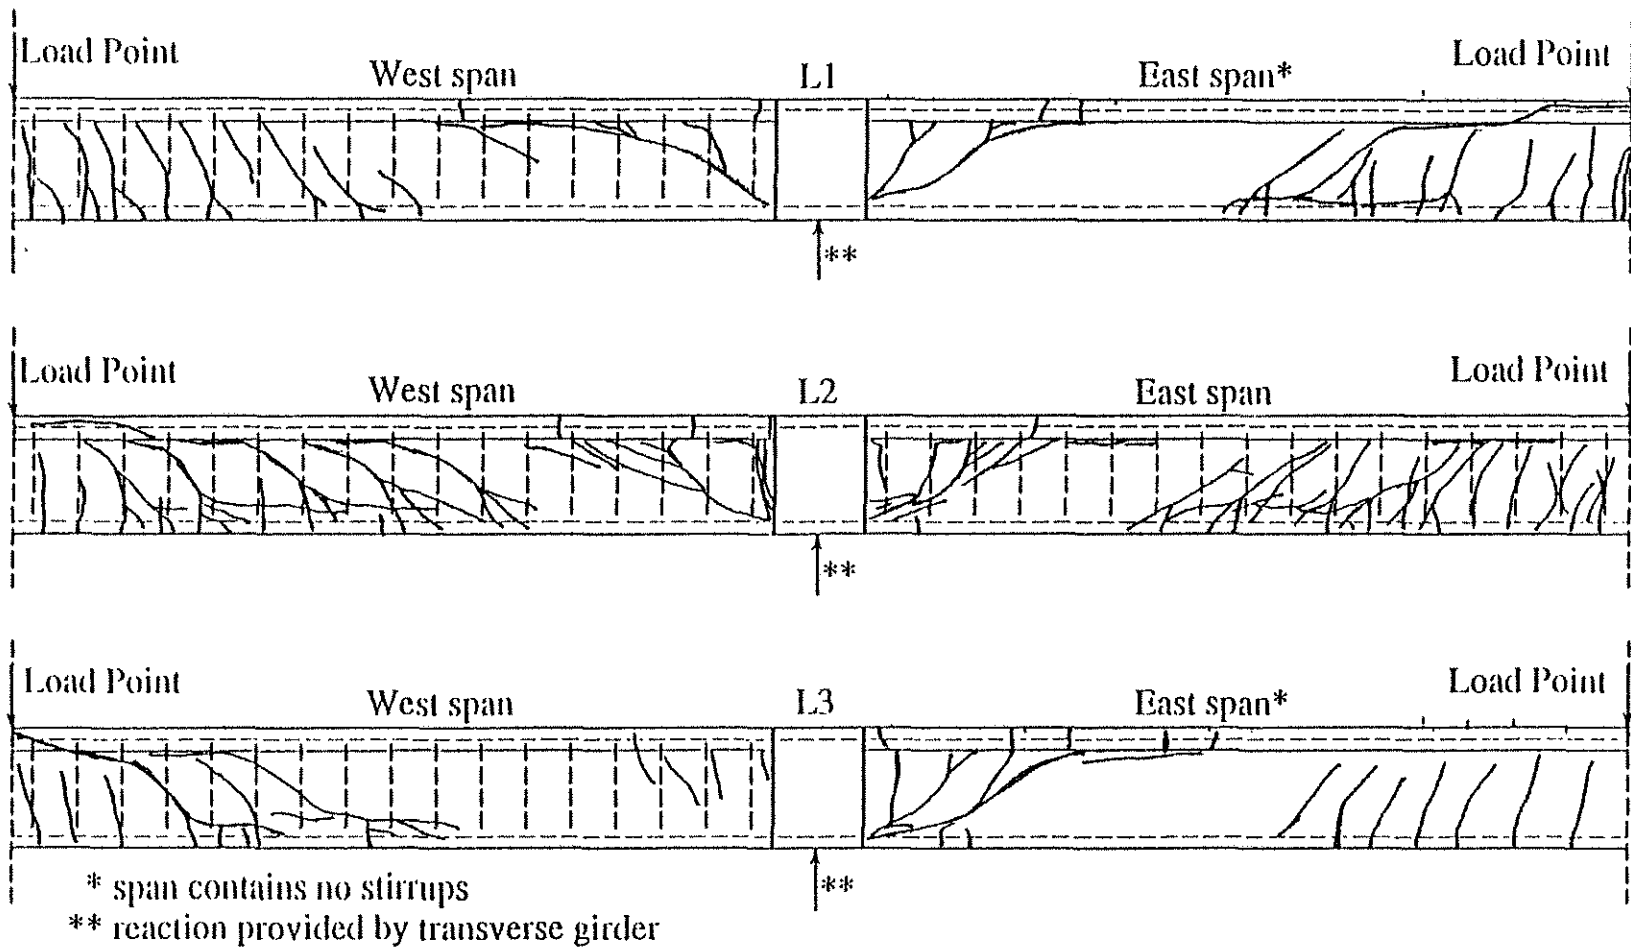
Crack patterns for joists L1, L2 and L3
